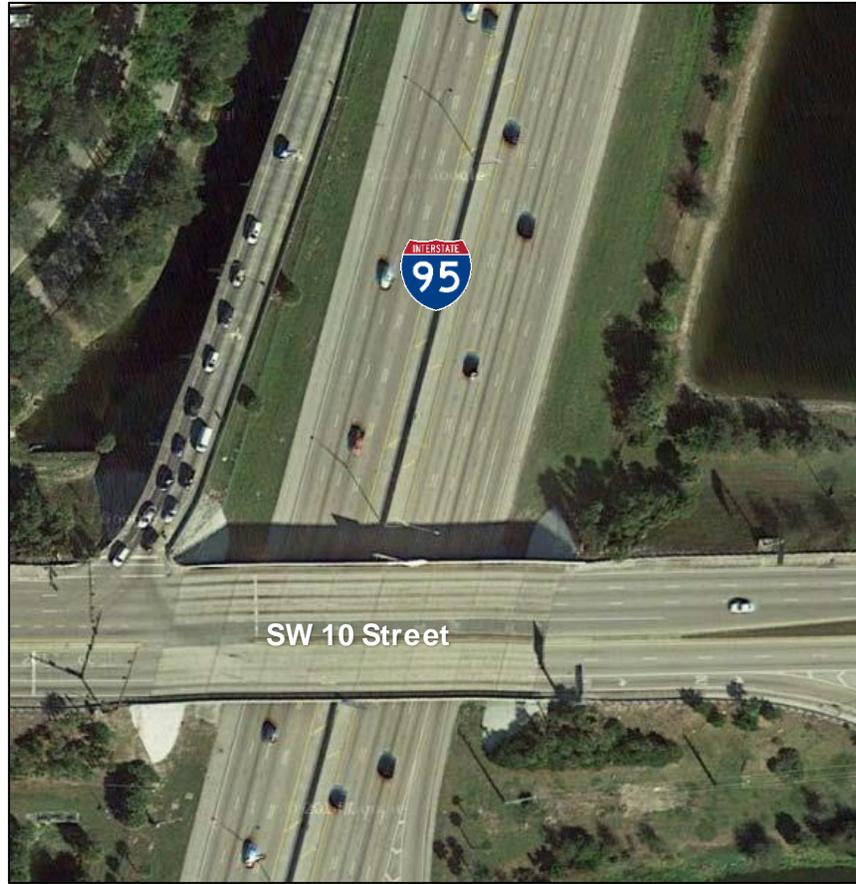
Bridges at SW 10 Street and I-95 Interchange (Bridge Nos. 860123 & 860564)
